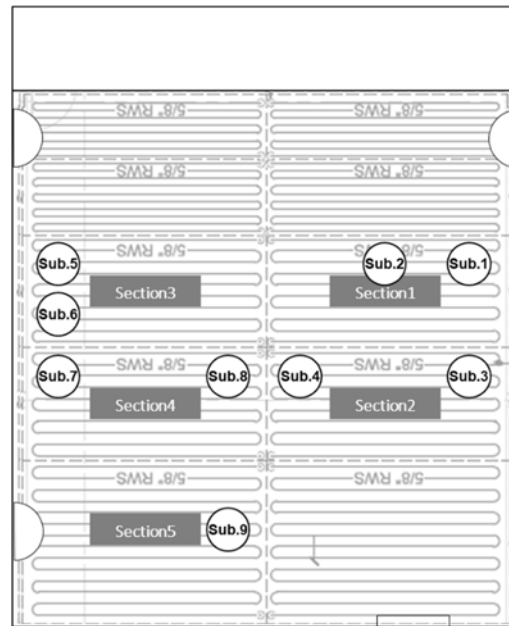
Space floor plan with occupant location and radiant floor control section.
